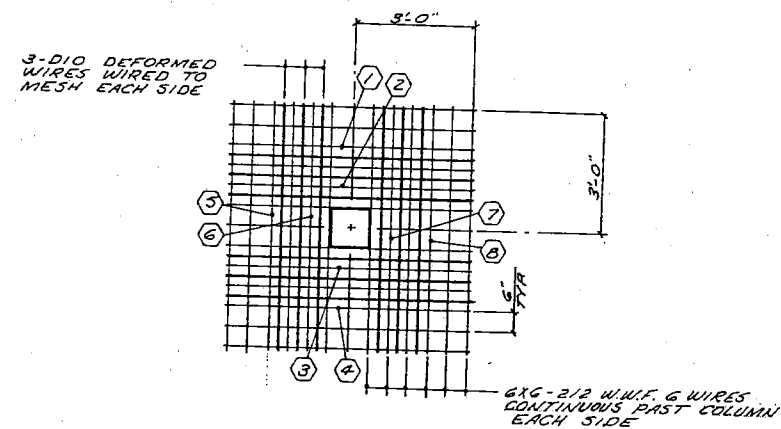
Outline of supplemental mesh reinforcement used in Specimen C-3 (Specimen L-3 similar)
